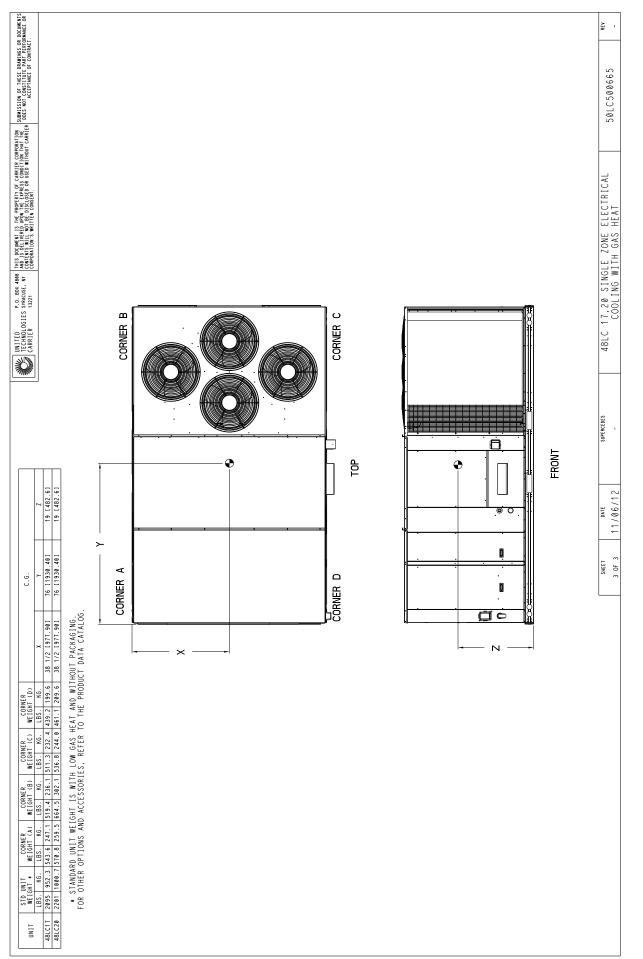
(cont.) - Unit Dimensional Drawing – 17 and 20 Size Units, Sheet 3 of 3
